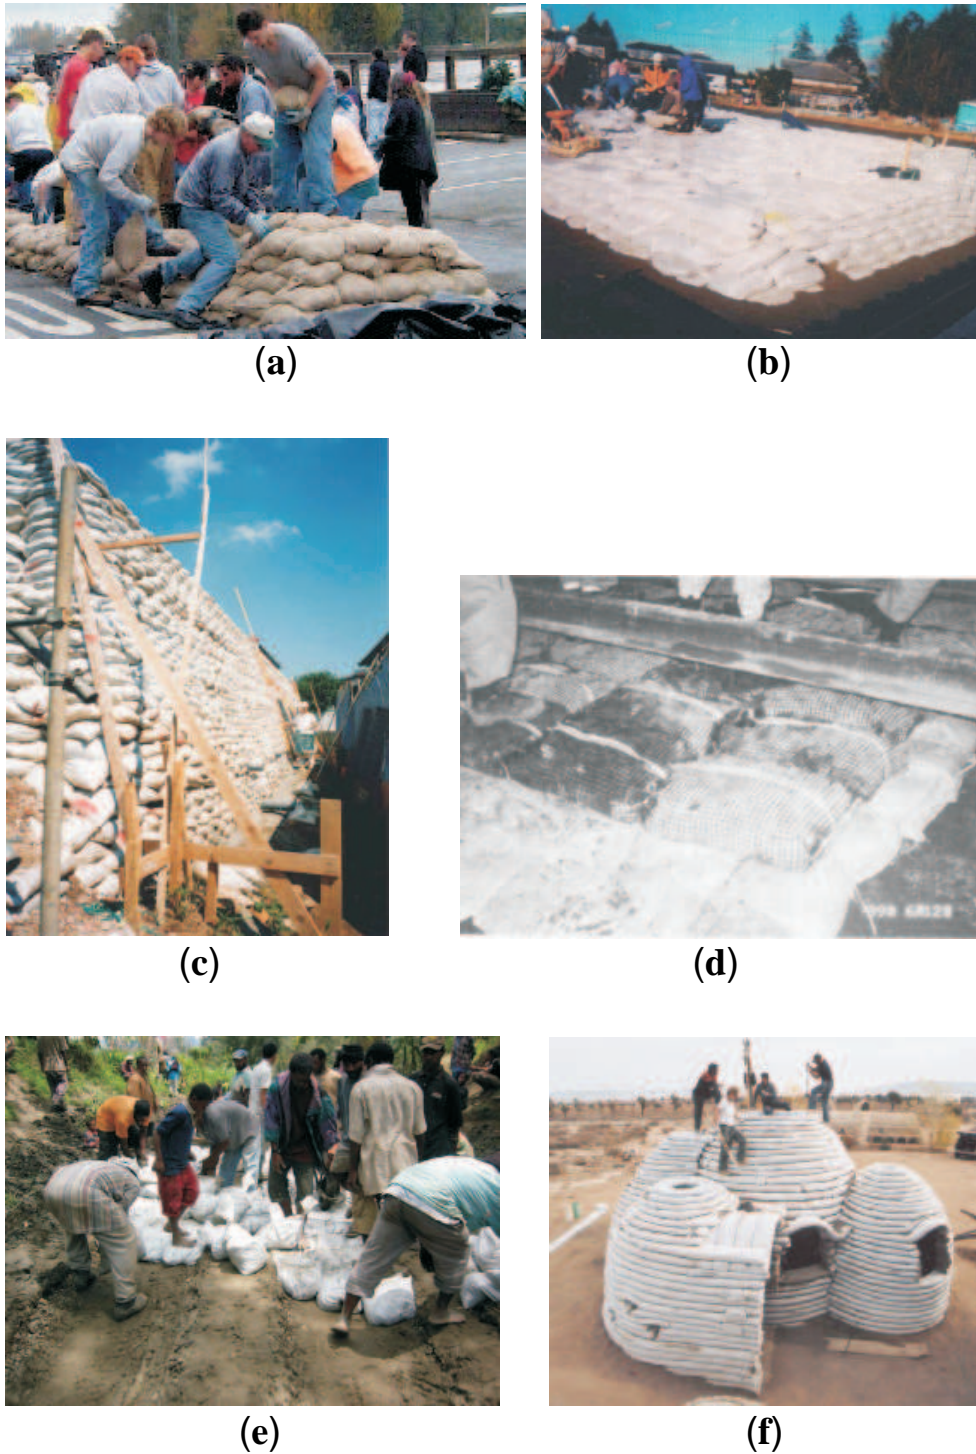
Soilbags used for (a) temporary flooding barriers, (b) foundation of building, (c) retaining walls, (d) foundation of ballast for railway, (e) foundation of road, (f) dome construction.
